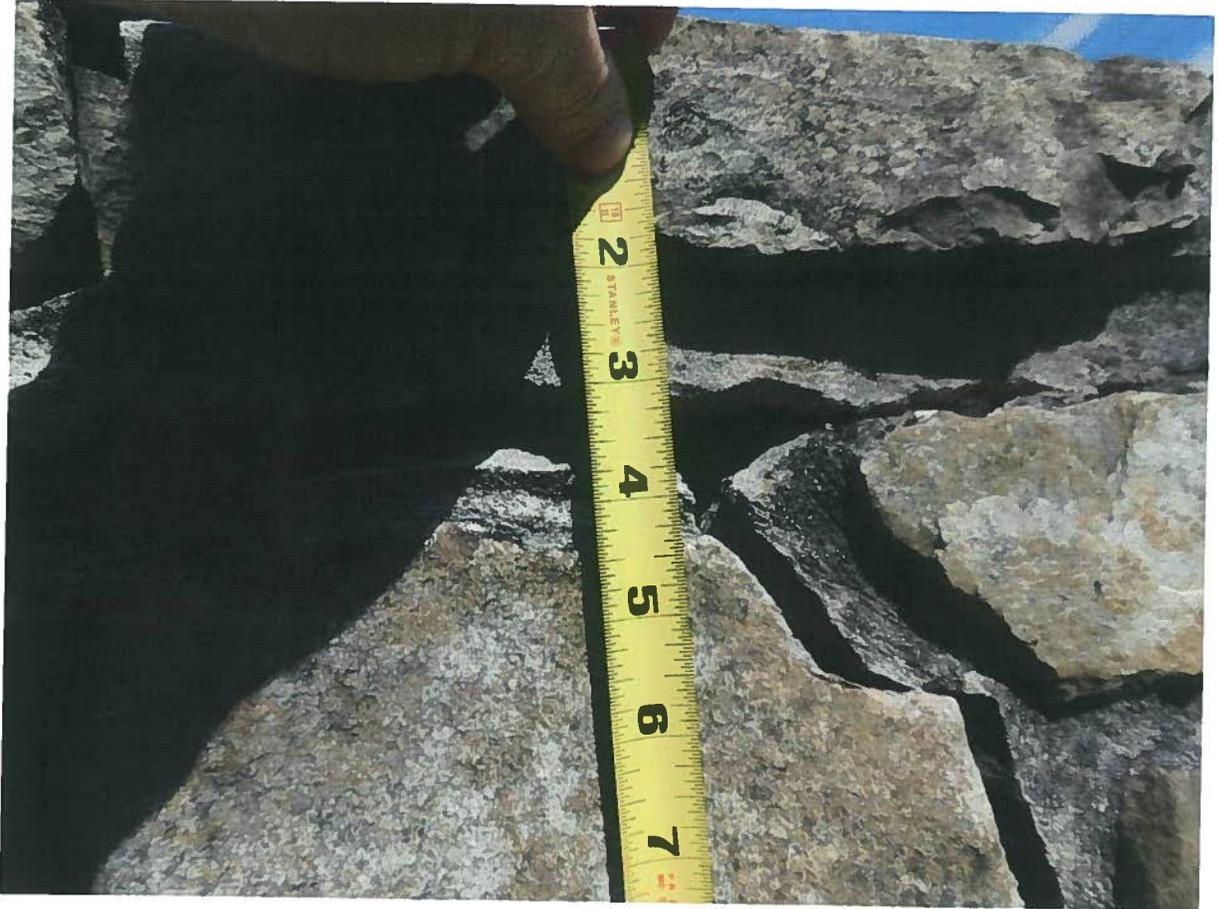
Crack in West Wing Wall - Below the Cap
